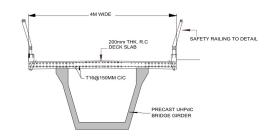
Kampung-Linsum Bridge, Malaysia [Voo et al., 2012]
